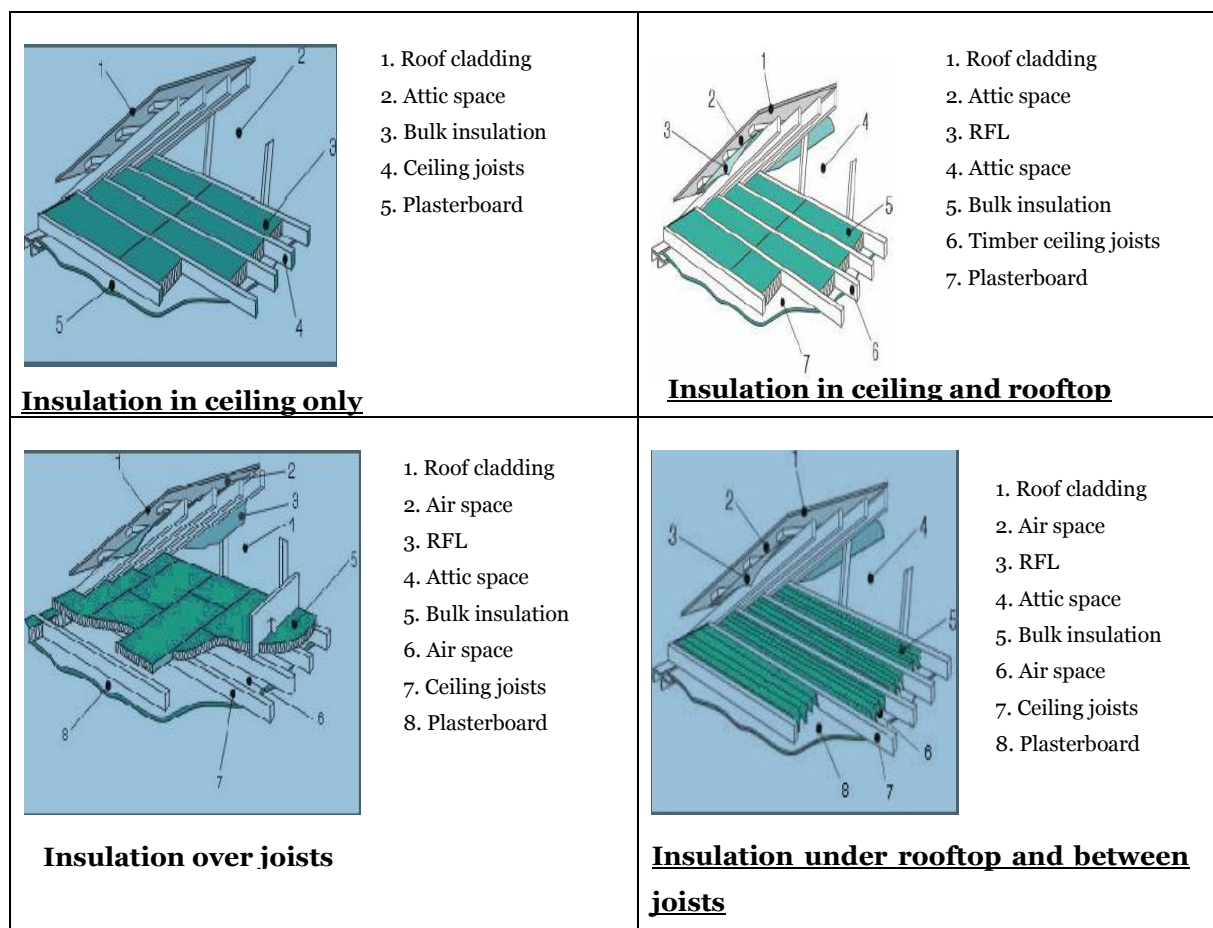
Pitched roofs with flat ceiling options (ICANZ 2009)
